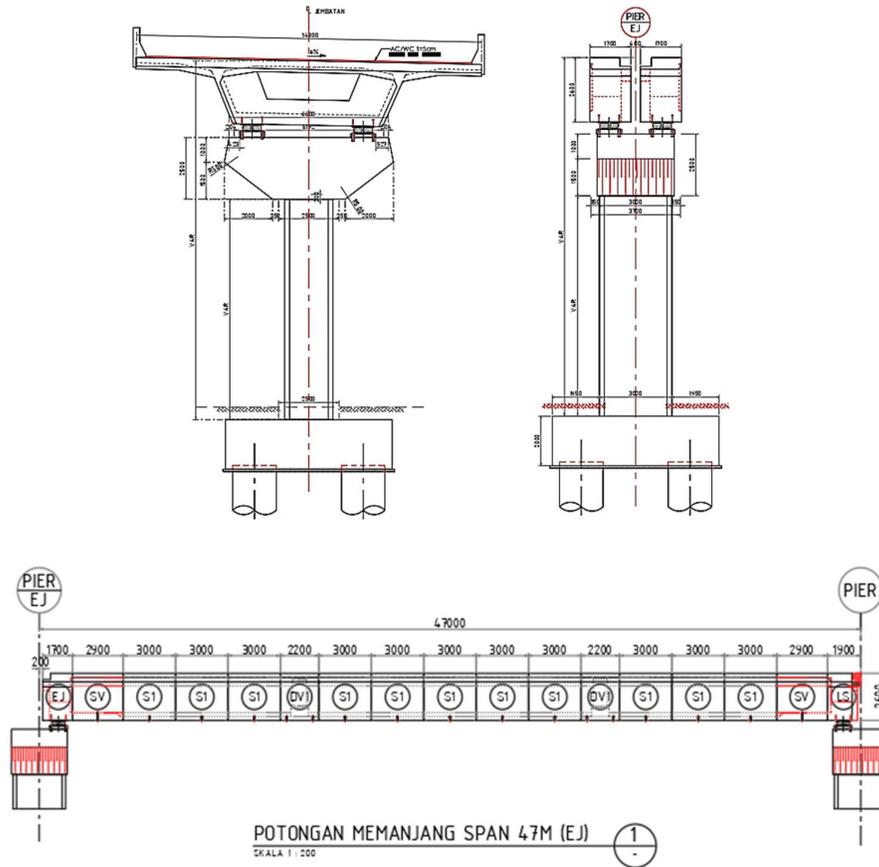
Bridge Structure Design Harbour Road 2 Toll Road Project
